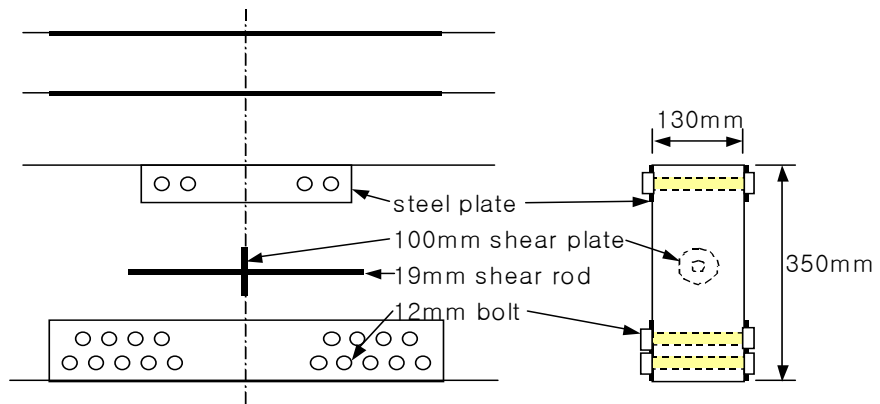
Bolted joint with splitted steel plates(SP-type connector).
